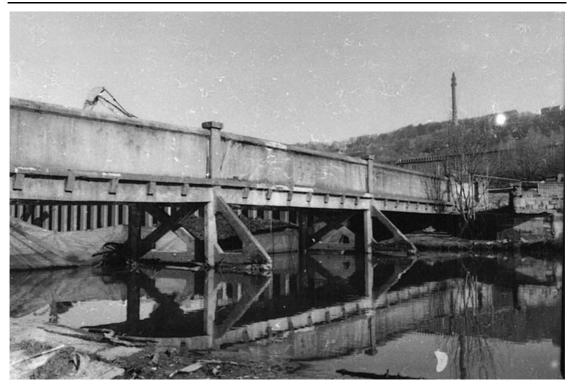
North-facing view showing south-east-facing bridge elevation, trestles (4a) and (4b), and cut-waters (5) and (5a) (MF SB03_04)
